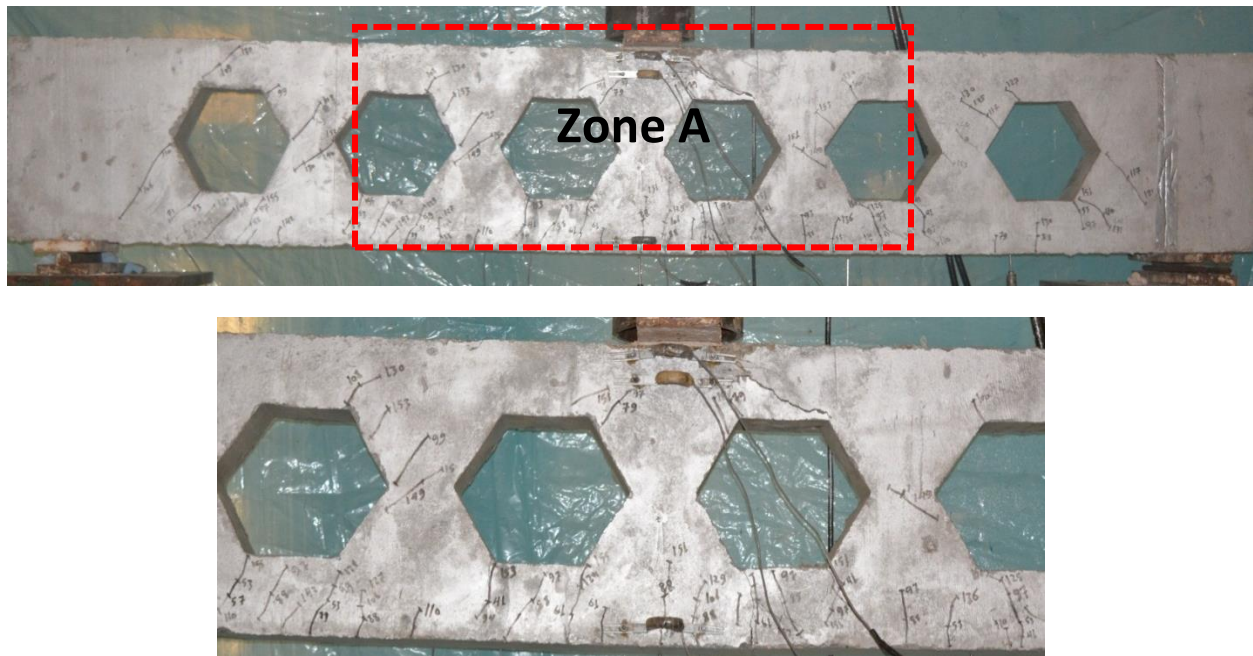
Cracks mapping on the longitudinal sections for castellated beam
